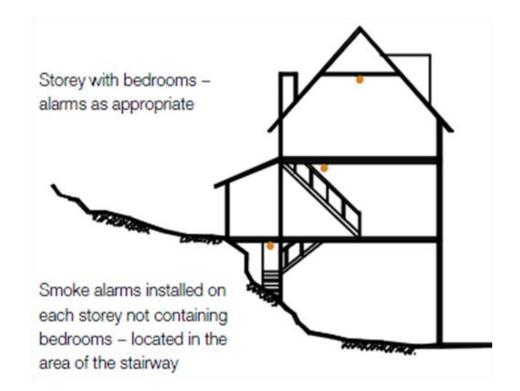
Section through a dwelling showing smoke alarms in the storey containing bedrooms (top floor) and the storeys not containing bedrooms. Smoke alarms located within area of stairway
